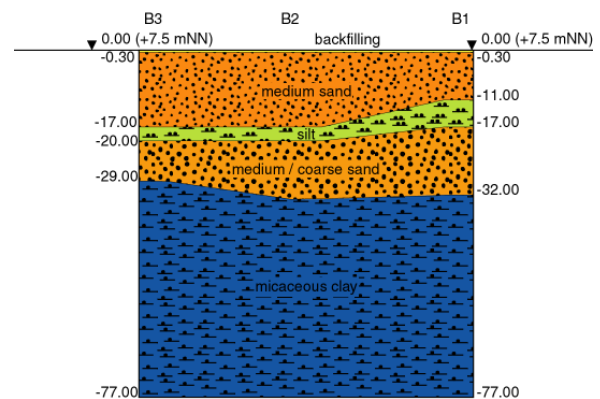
Soil buildup of the test site (cross section B1-B2-B3).
